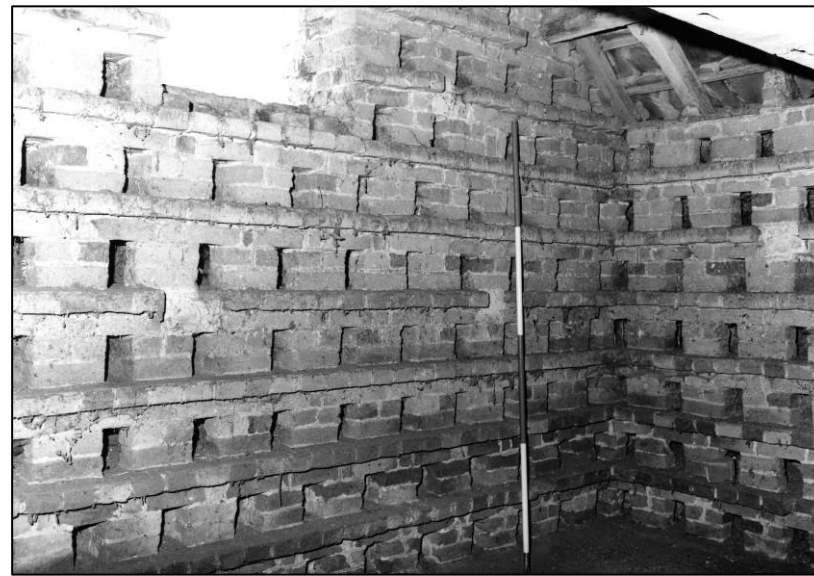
Granary: 2F pigeon loft, looking W (photo 4/7).
